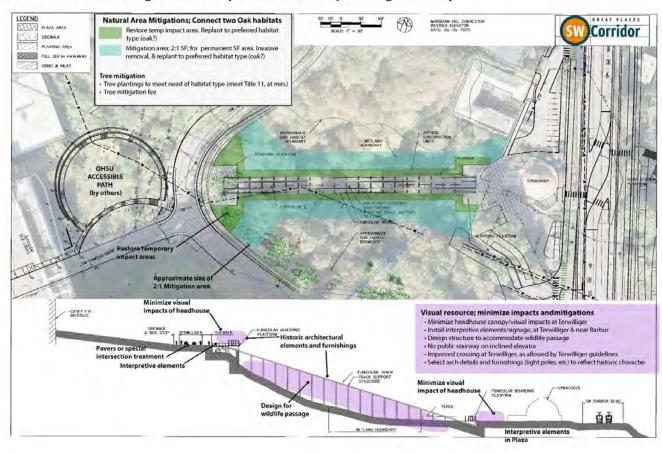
Exhibit C - Section 4(f) Tree Mitigation at Terwilliger Parkway and Lair Hill Park
